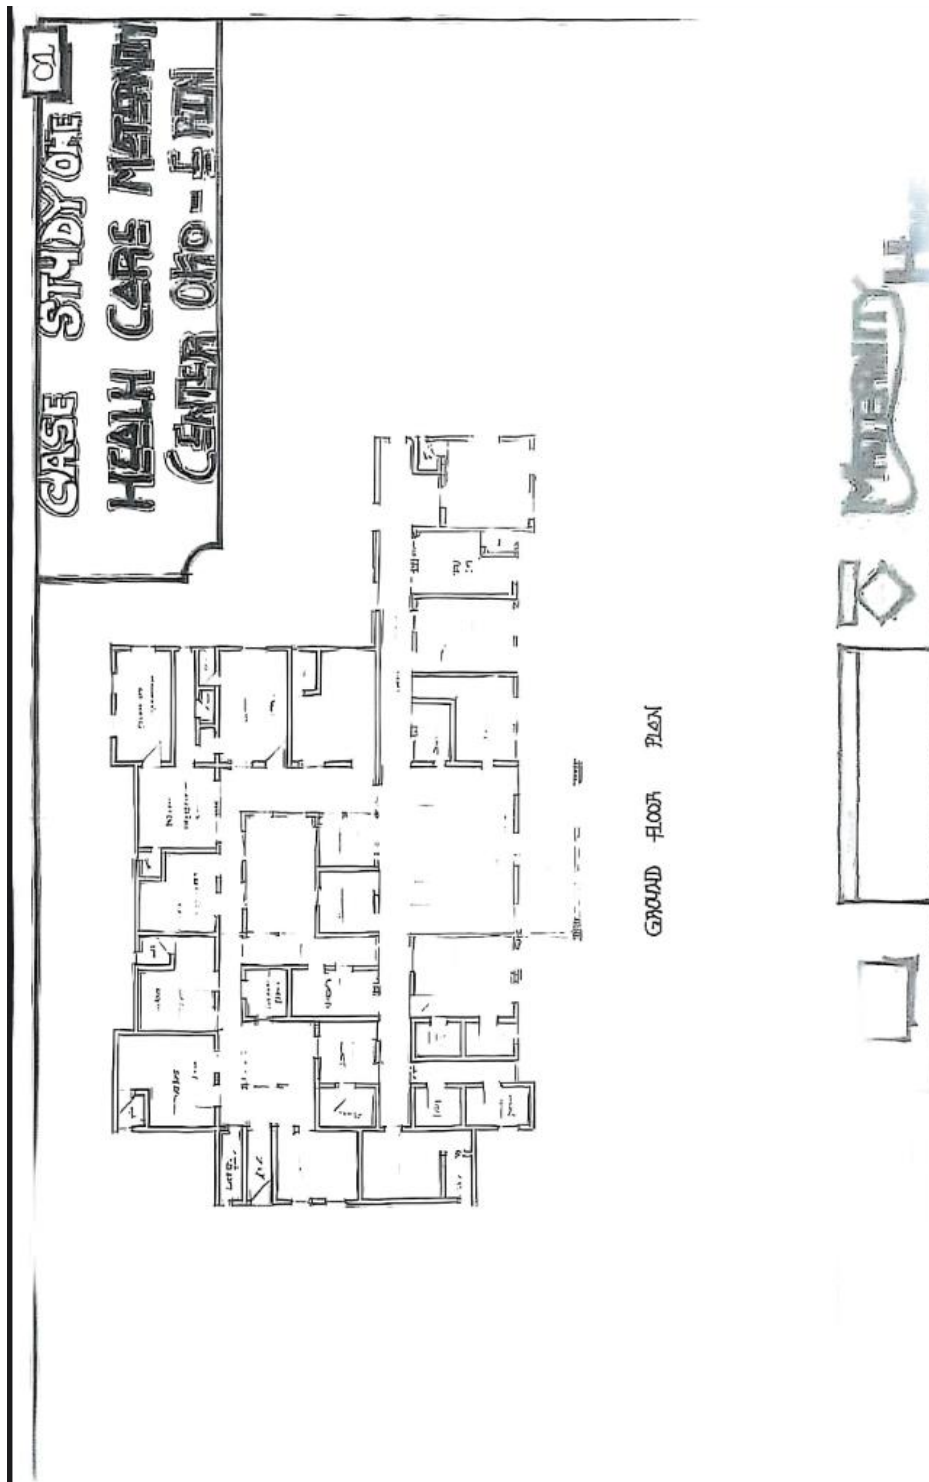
GROUND FLOOR PLAN OF CASE STUDY 1
